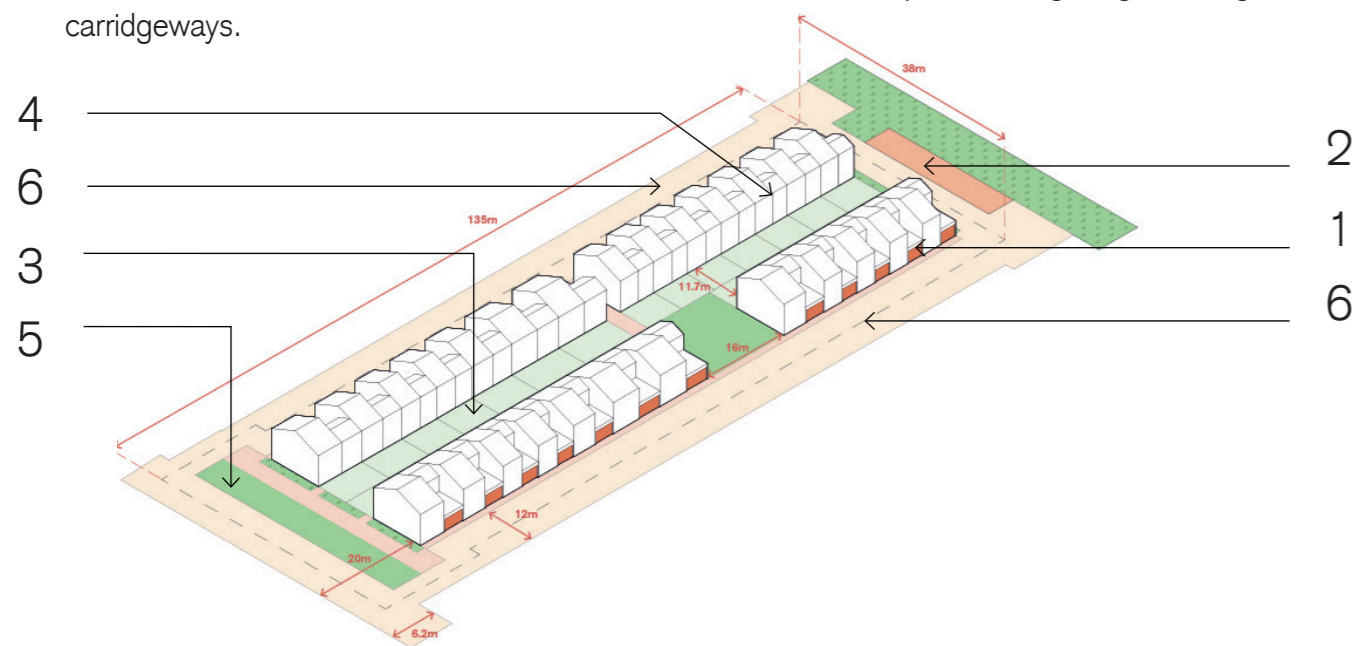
Typical block plan and site layout at Lime Tree Square
